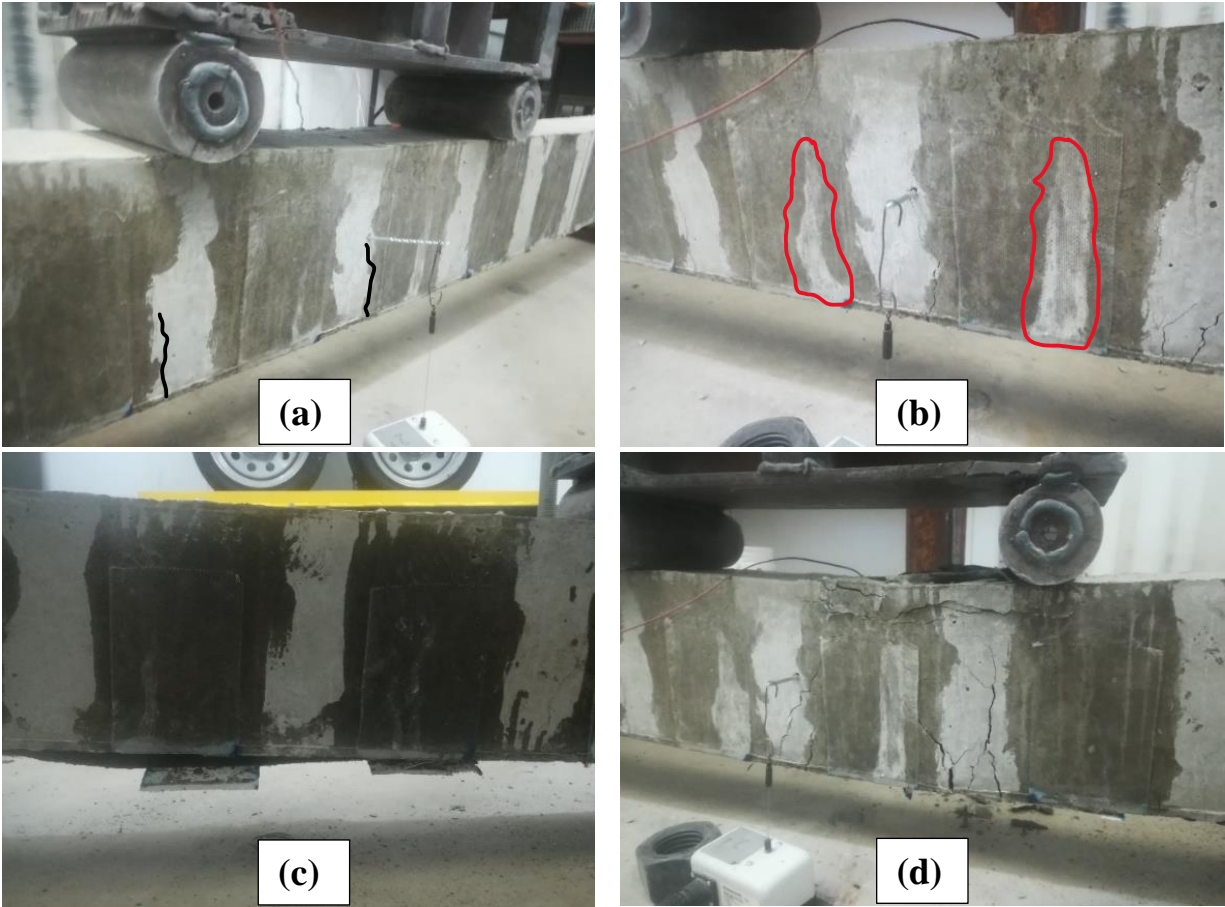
SBLTCT beam failure; (a) Flexural cracks, (b) Delamination of transverse FRP, (c) Debonding of longitudinal FRP and tearing of transverse FRP, (d) Concrete crushing.
